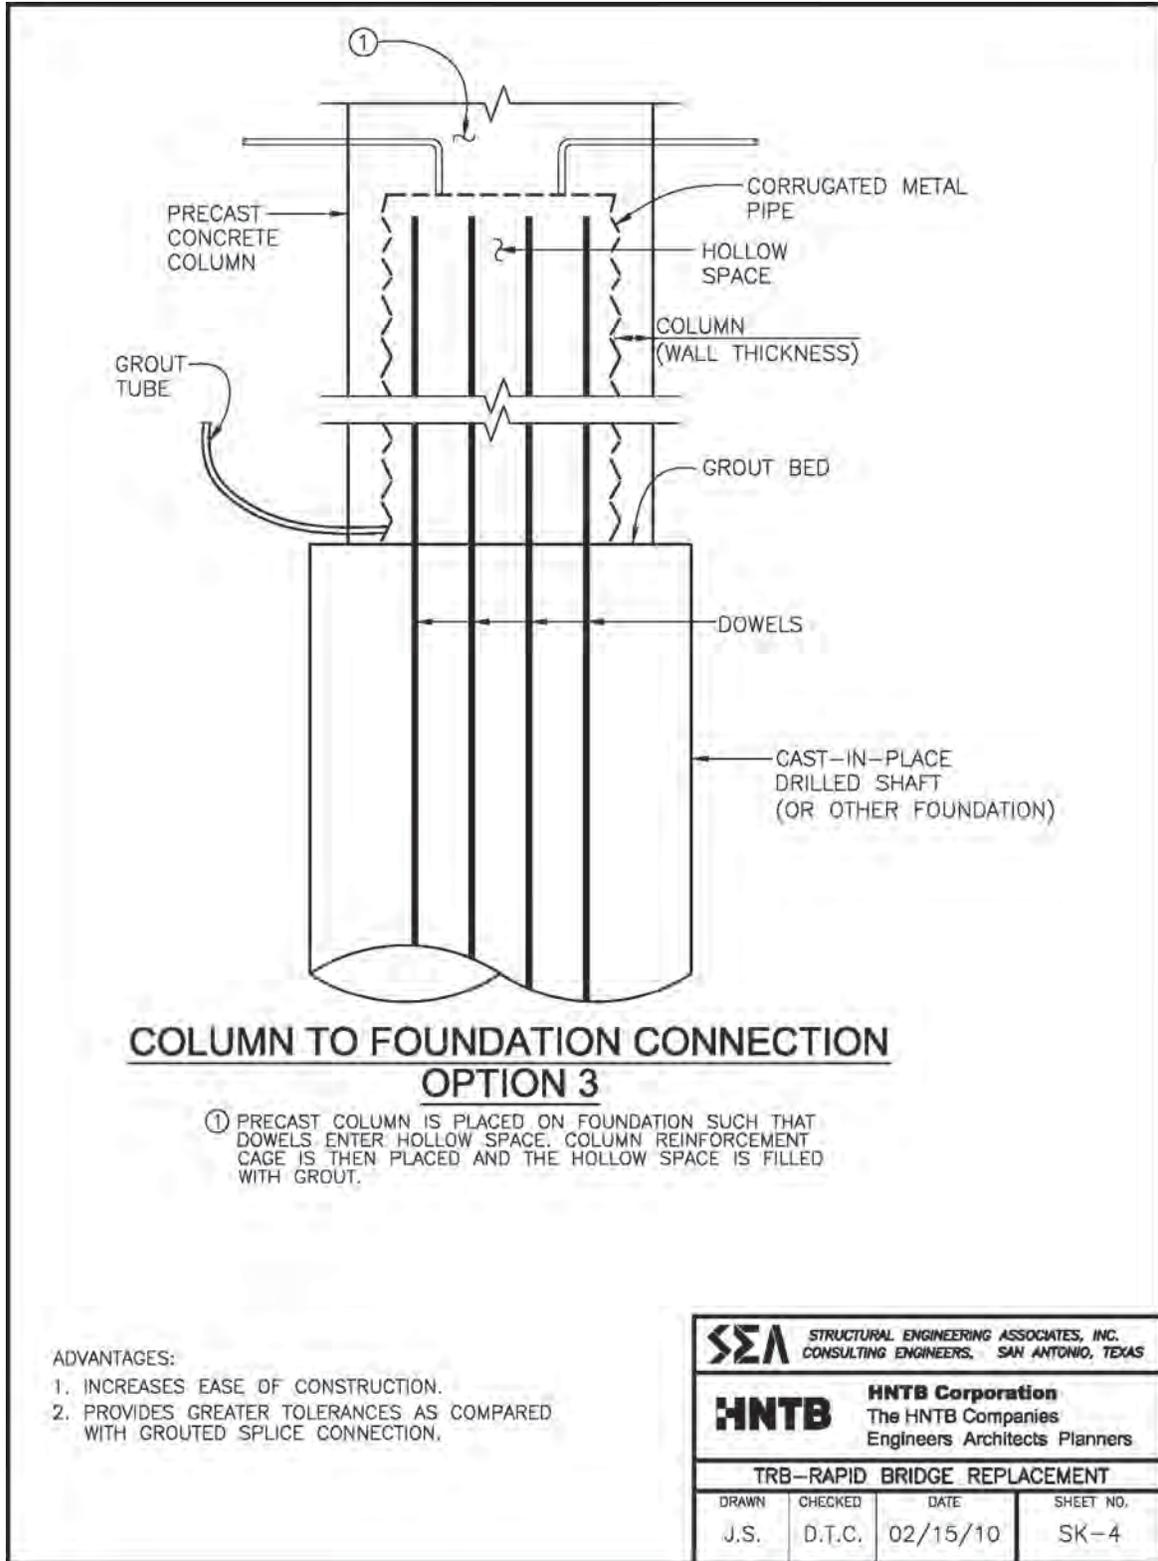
Alternate column-to-foundation connection—Option 3.
